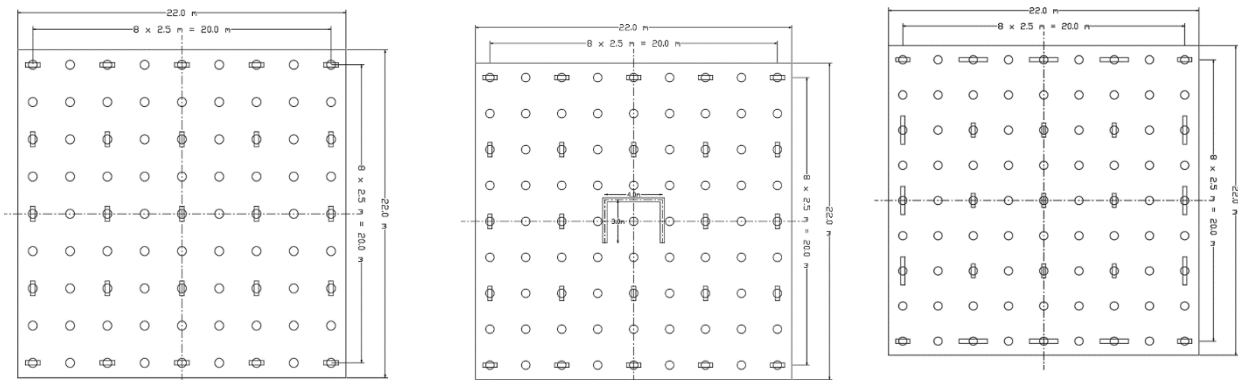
Piled raft foundation layout for column, core and shear wall systems
